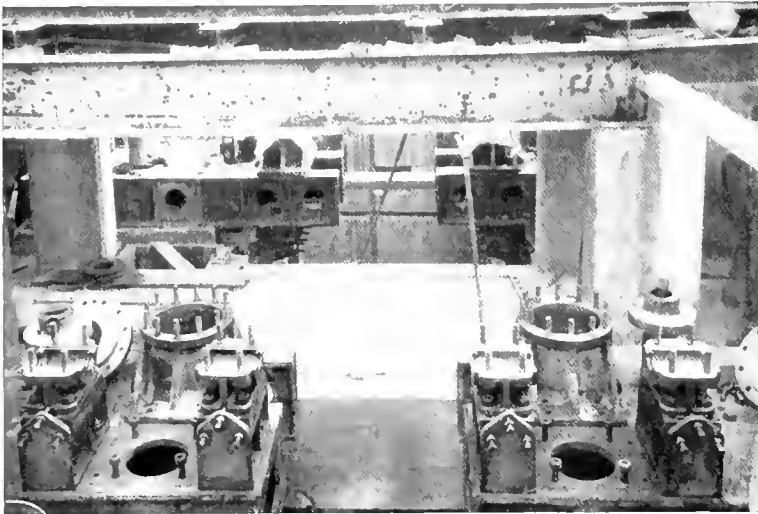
Miraflores Lower Locks. Rising Stem Gate Valve Machinery Chambers Nos. 442 and 443, West Side Wall. Machinery cleaned preliminary to assembly. July 18, 1913
